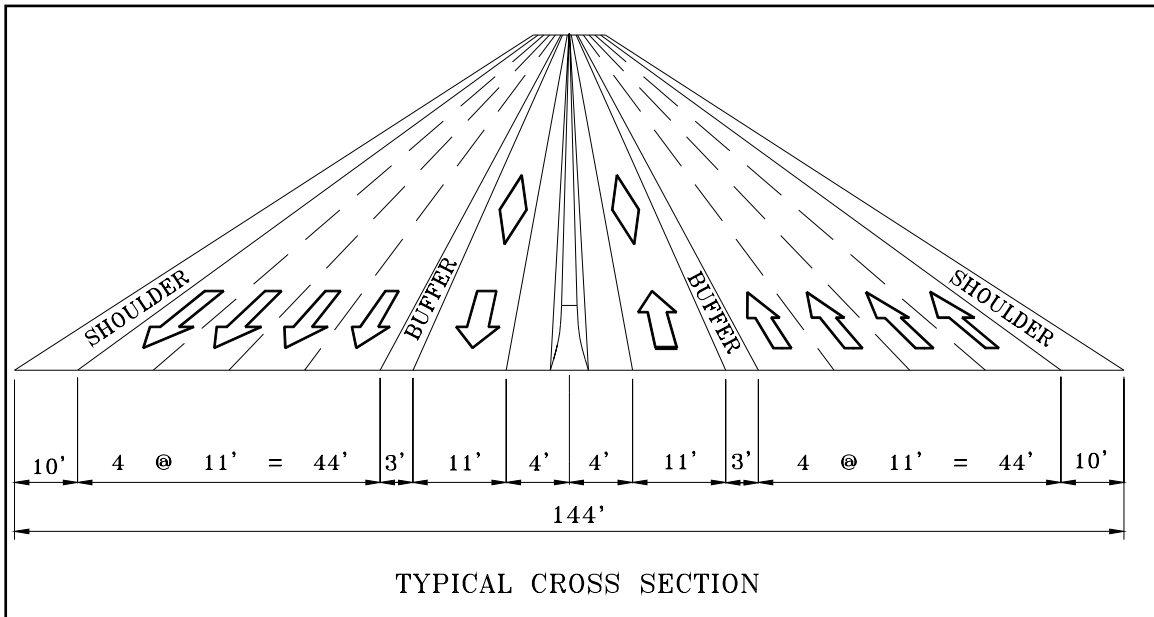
IH-635 (LBJ Freeway) Cross Section between Josey Lane and Coit Road.
